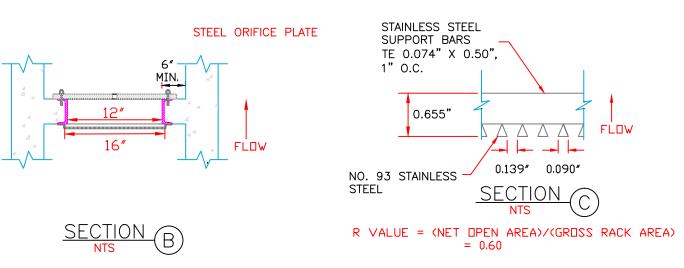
TYPICAL OUTLET STRUCTURE
